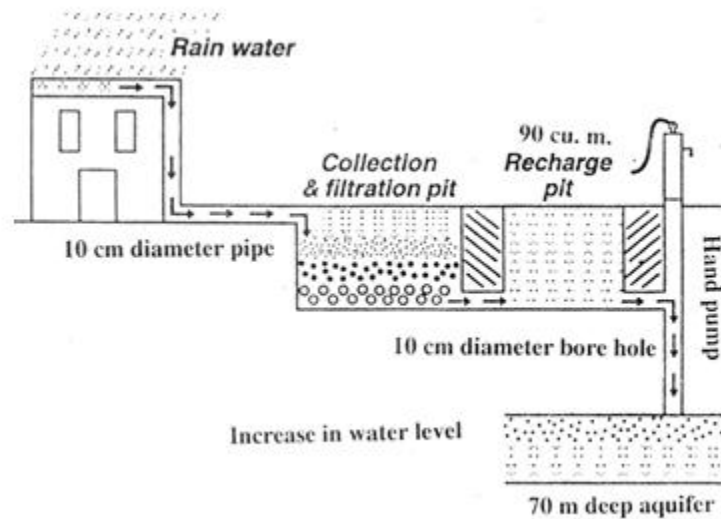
4 Schematic Representation of Underground Trench Layout (Sharma, 2007)
